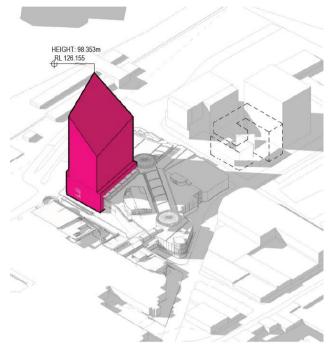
The Hub indicative buildings envelope Source: Scott Carver, Penrith Living Centre, Planning Proposal Design Report, 8 April 2021
